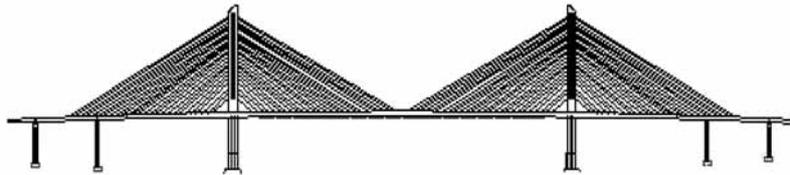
Elevation of Xinzao Pearl River Grand Bridge
